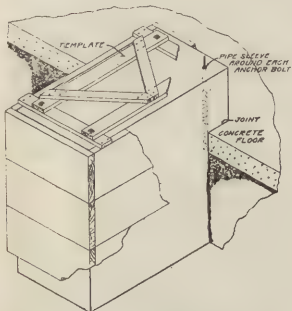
Concrete Engine Foundation Showing Template and Bolts in place.
